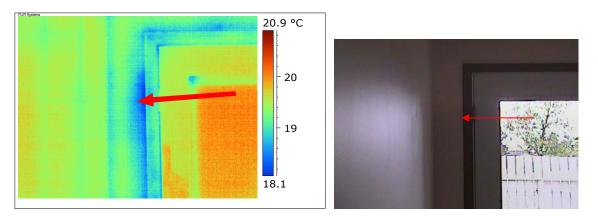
Captured at: (Suite 15 East hall ceiling/wall)
